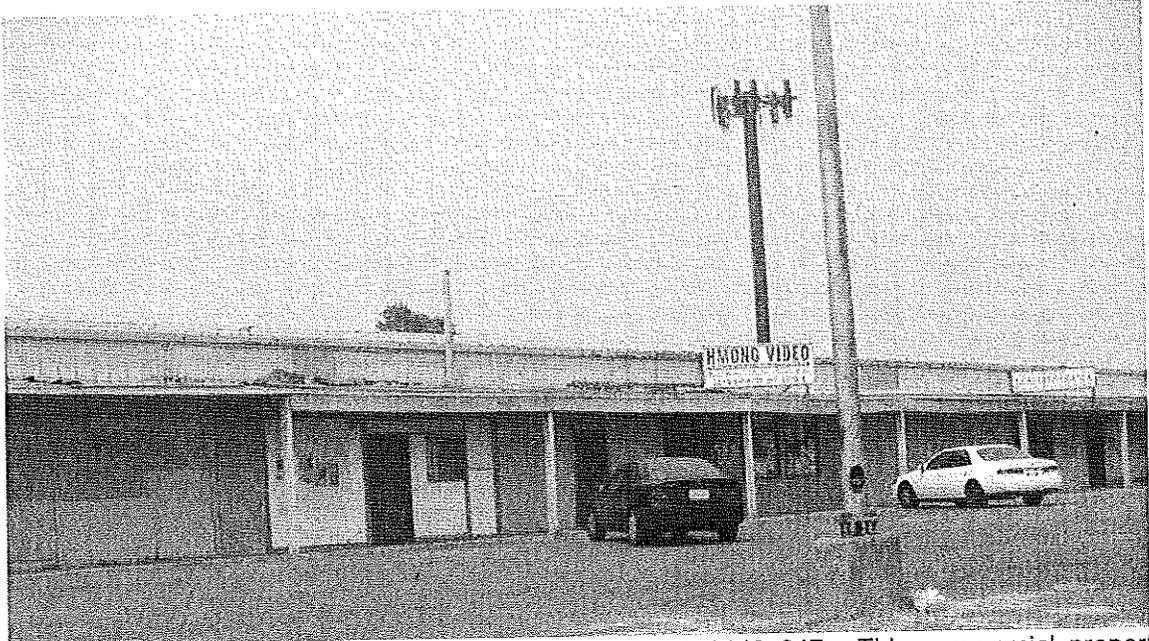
3500 Block of Norwood Avenue, APN 250 0140 047: This commercial property is seriously dilapidated. The roof, eaves, and overhangs are peeling and sagging. The roof is made of corrugated sheet metal and prone to rust. The exterior building materials are damaged and cracking at the foundation due to faulty weather protection and neglect. Although the building has some operating tenants, several units have boarded windows. This property also has delinquent property taxes as of September 19, 2008. The property owner has neglected to maintain the physical, functional and financial aspects of this building.
